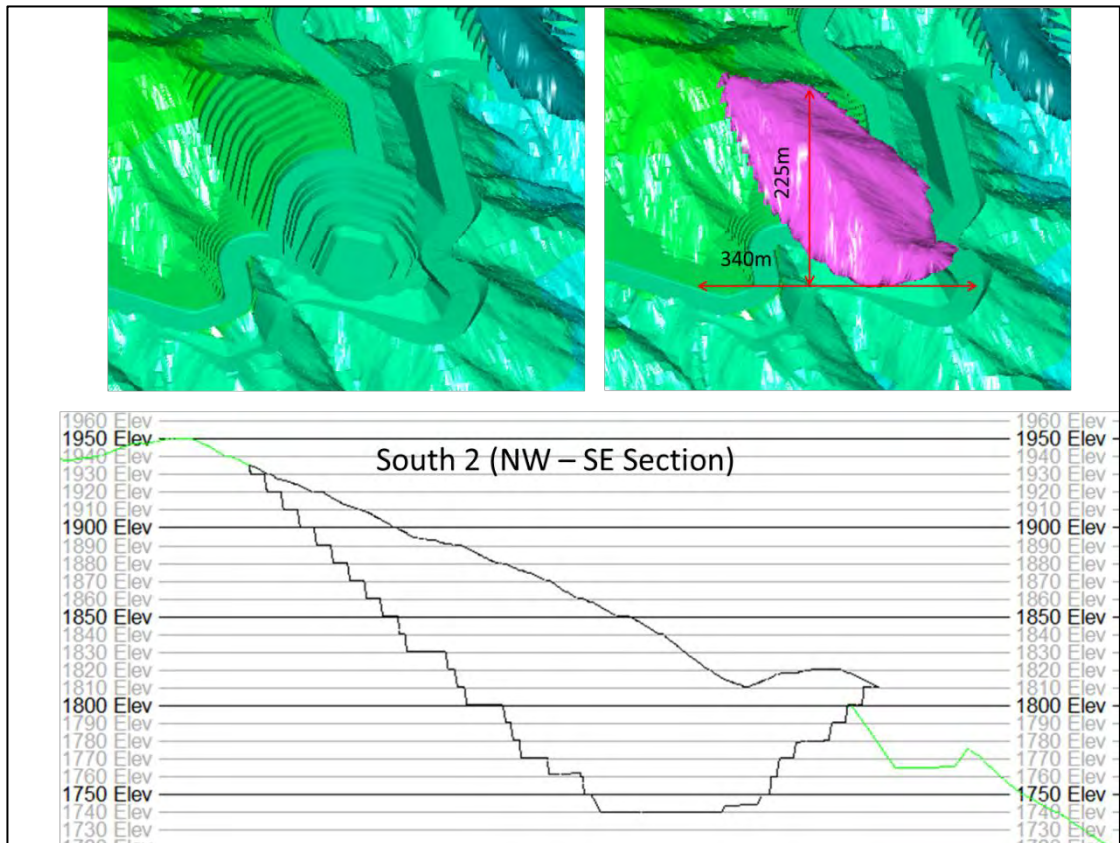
South 2 Pit Design – Operational Stockpile Area
